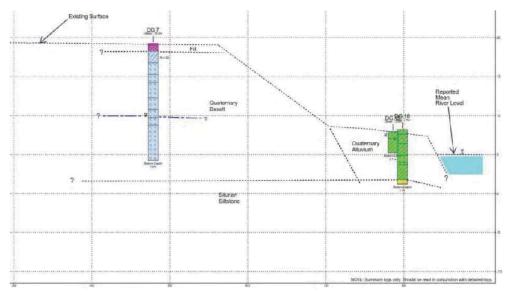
Cross Section C-2 Extract (see Appendix B for full cross section drawing)
